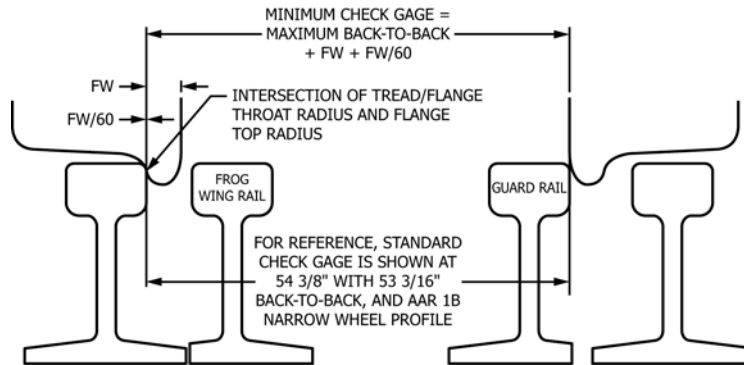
Minimum Check Gauge for Guard Rails in Turnouts and Rail Crossings (FW stands for Flange Width)
